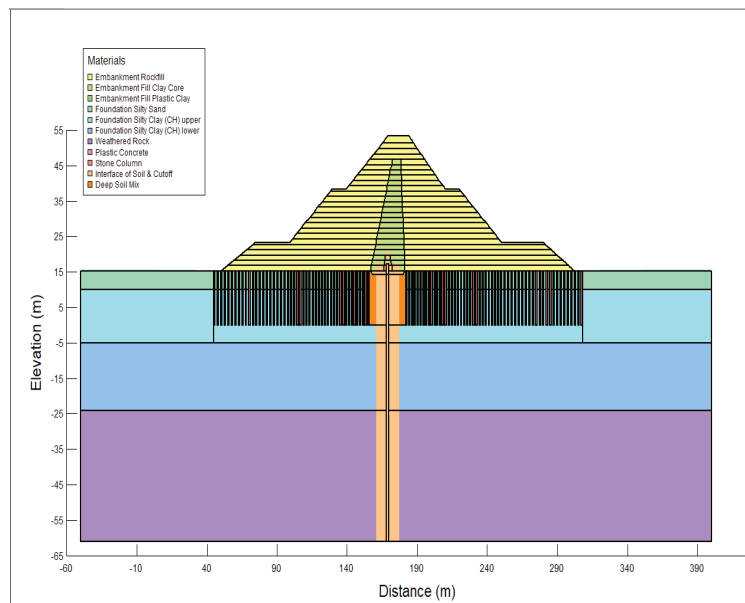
Typical Cross Section of Earth Core Rockfill dam at Gap-II Region-II
